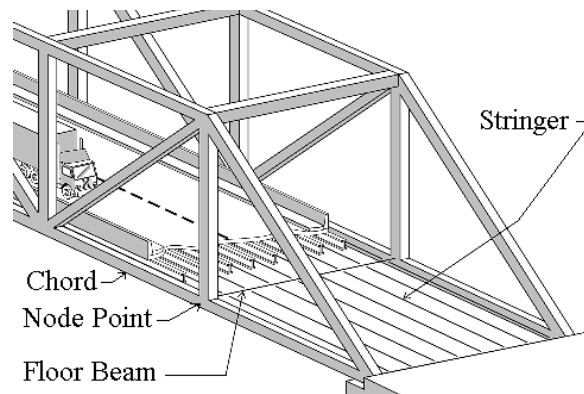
Configuration of the Typical Steel Truss Through Bridge
